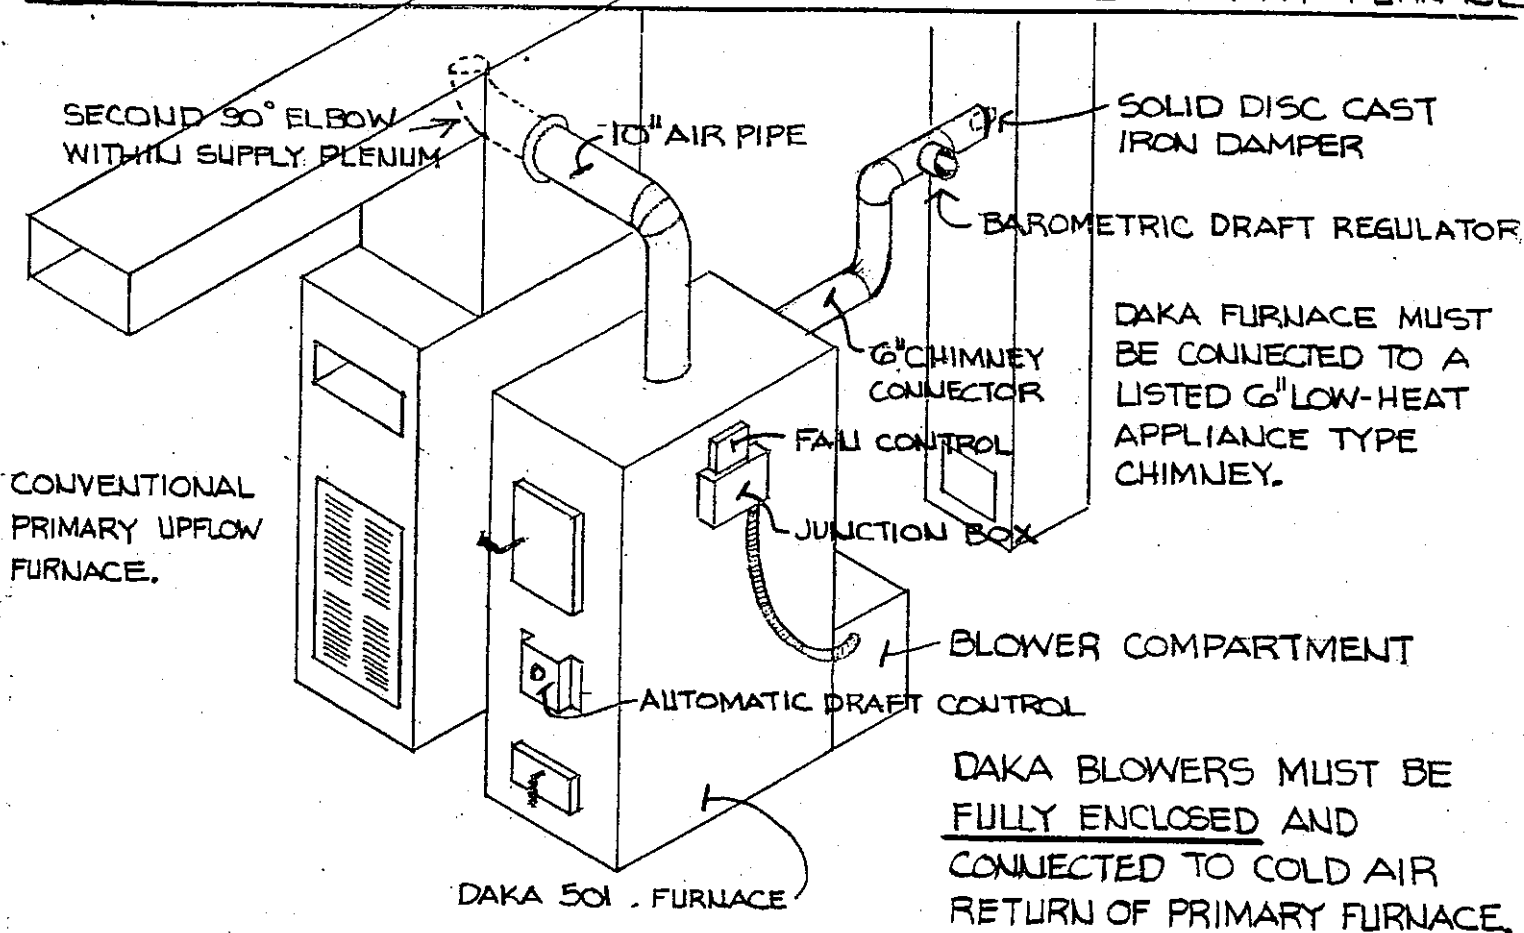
TYPICAL INDEPENDENT CENTRAL FURNACE INSTALLATION
